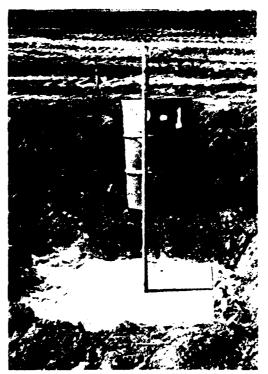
Settlement plate on prepared embankment foundation. Note the  $3\,{}^{\rm t}x3\,{}^{\rm t}$  steel base plate and 1-inch diameter galvanized steel riser pipe. Not shown is the outer 2-inch diameter galvanized steel protective pipe.
